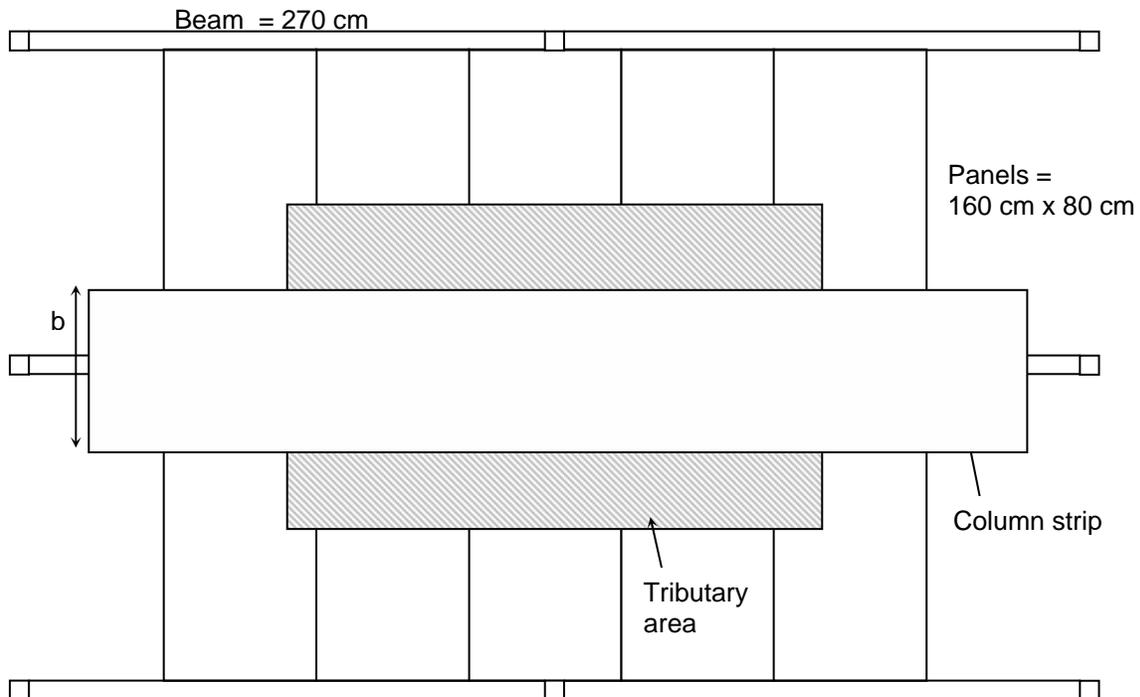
Reinforced slab shore beam shear design strength load capacity (100x100 mm shore, 0.8 m primary beam, 1.6 m panel)
